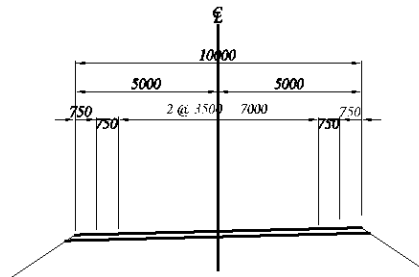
Typical Cross Section for Ramp (2-lane, Earth Work)
